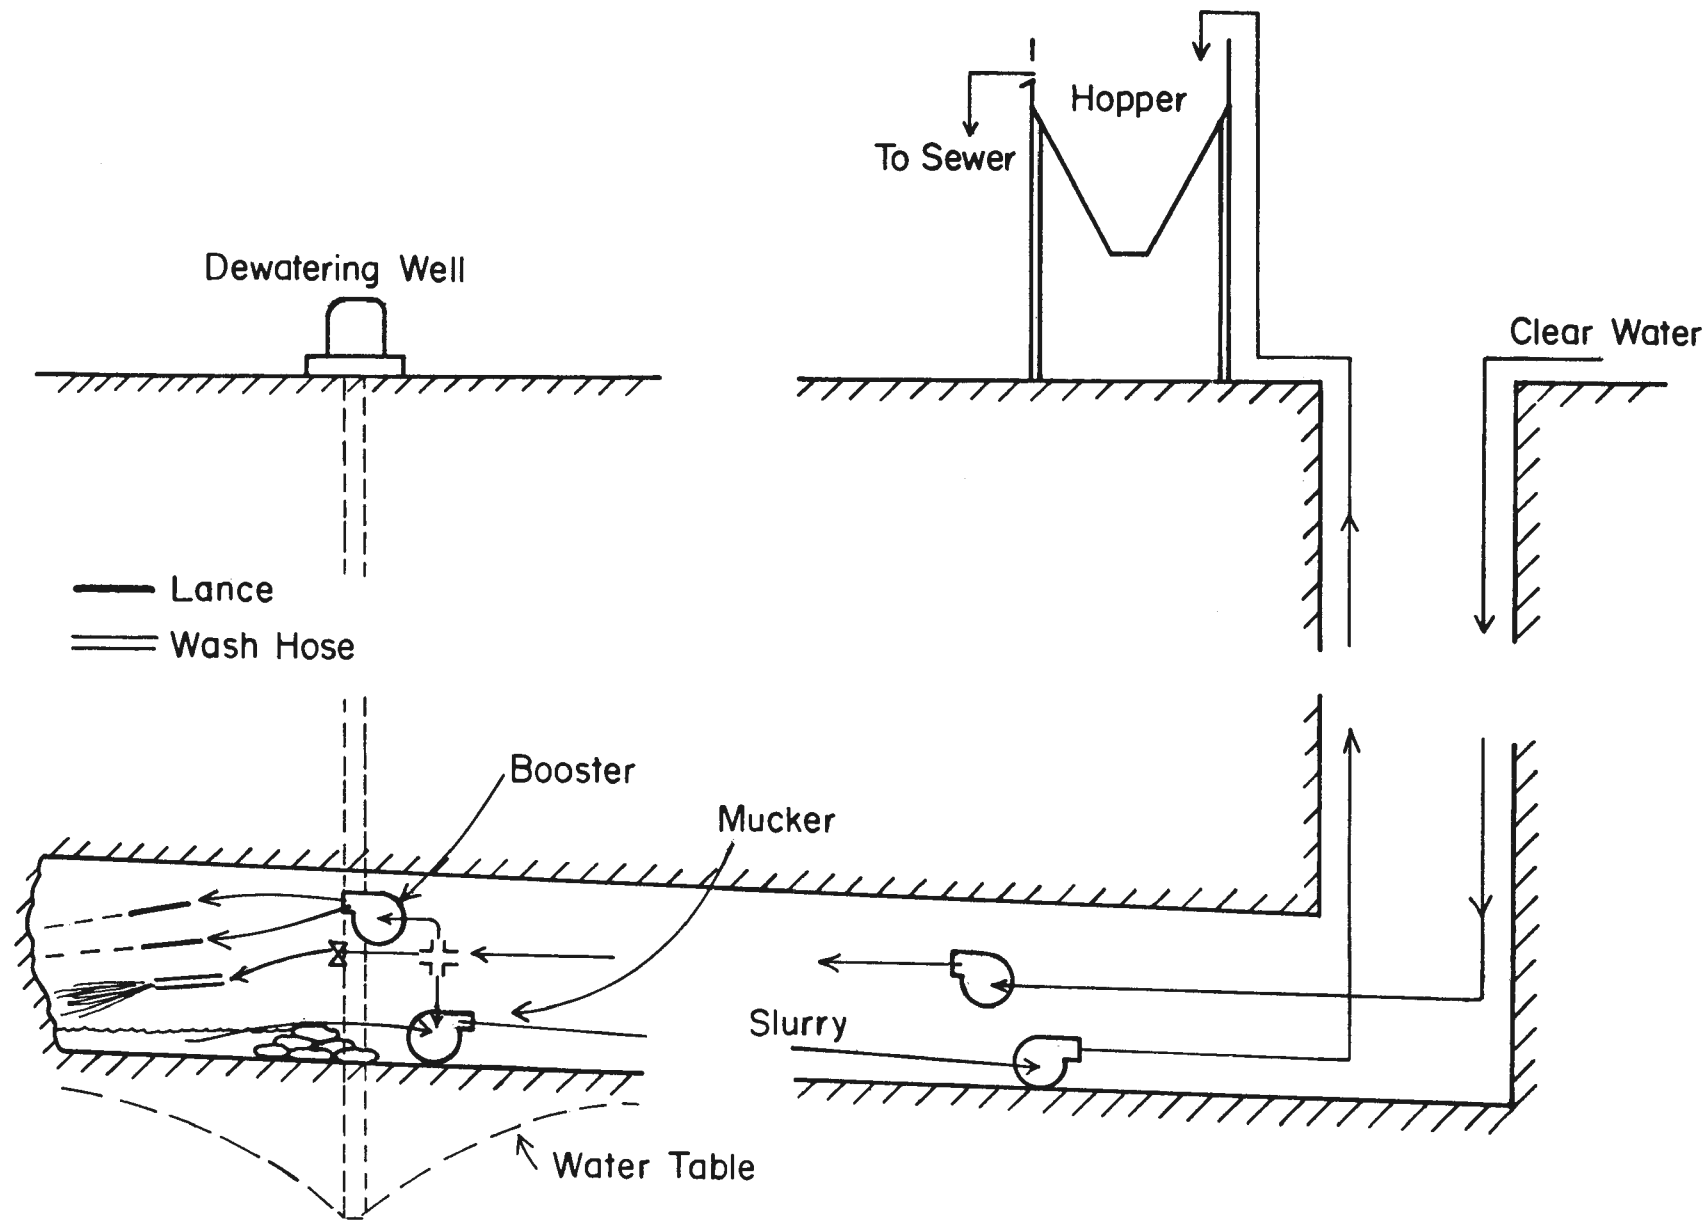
TYPICAL HYDRAULIC TUNNELING WATER CIRCUIT
